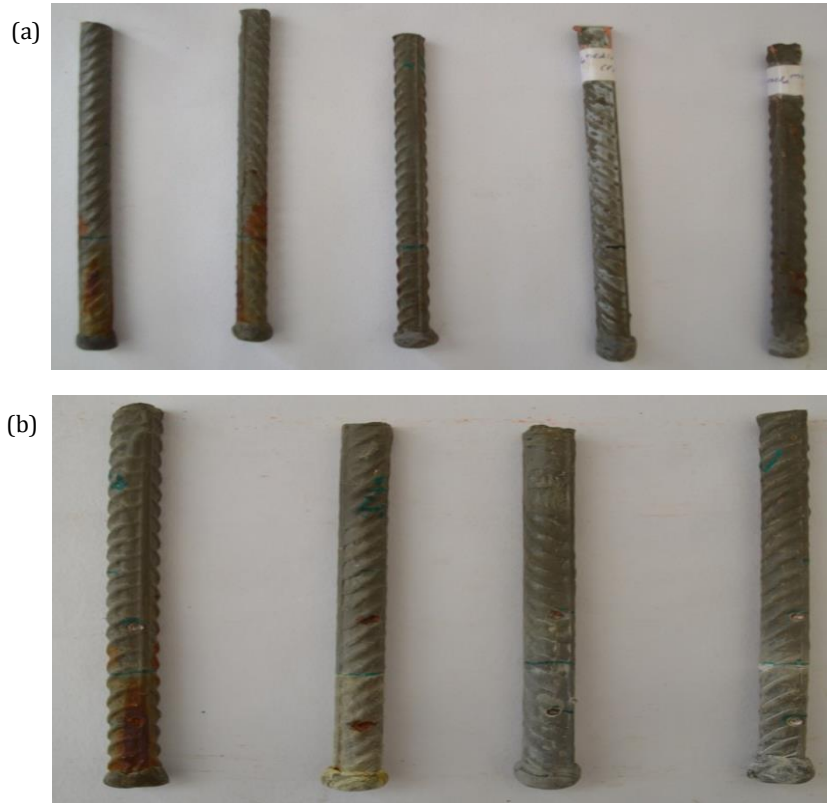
(a) View of coated specimen immersed in 3M CaCl₂ medium after the test; (b) View of drilled specimen after subjected to the chemical resistance test.
